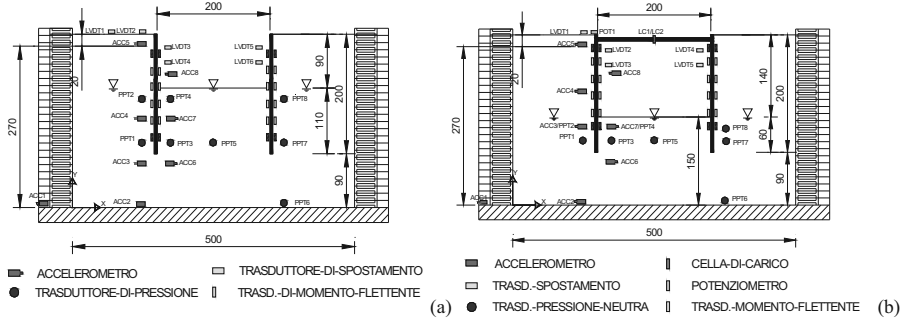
Layout instrumentation at model scale for CWU1 (a) and PWU1 (b).
